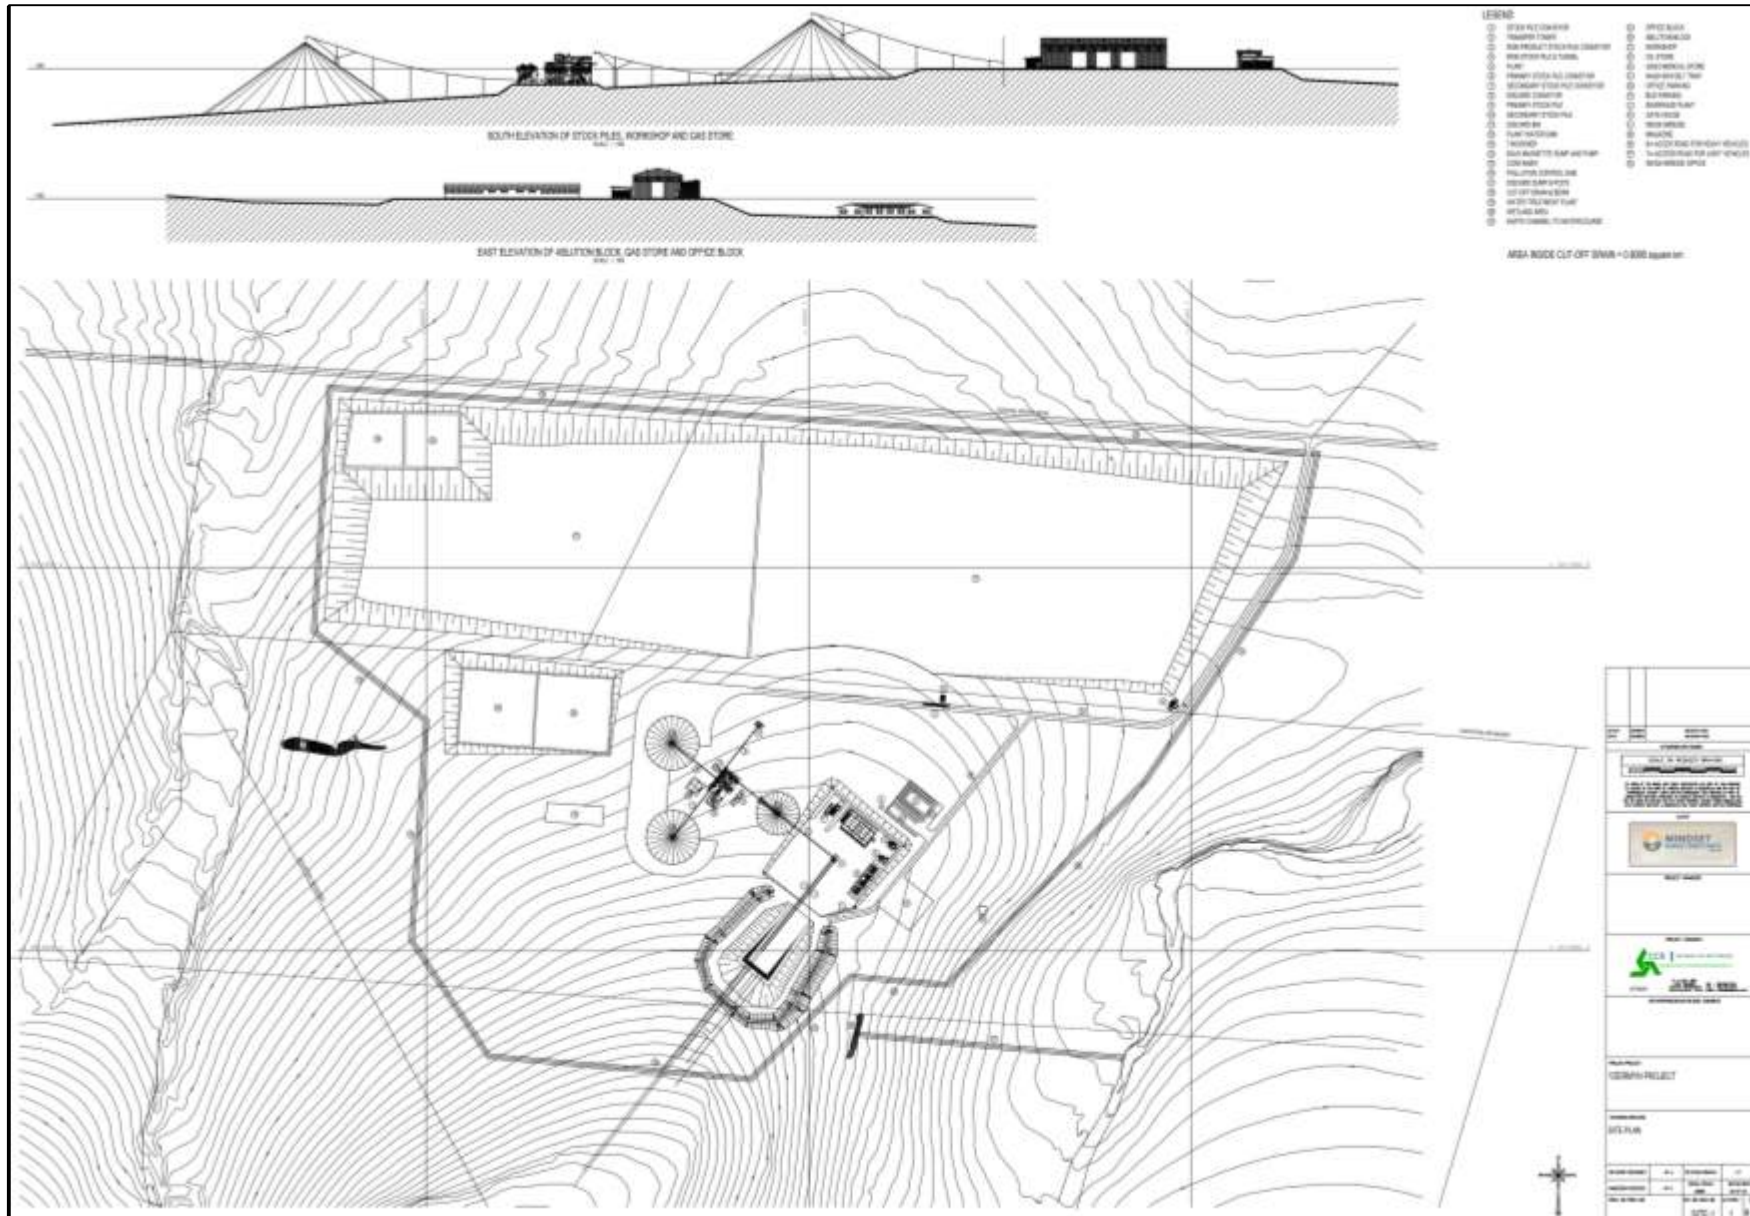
Preferred Surface Infrastructure Layout Plan (Source: Mindset, 2013)
